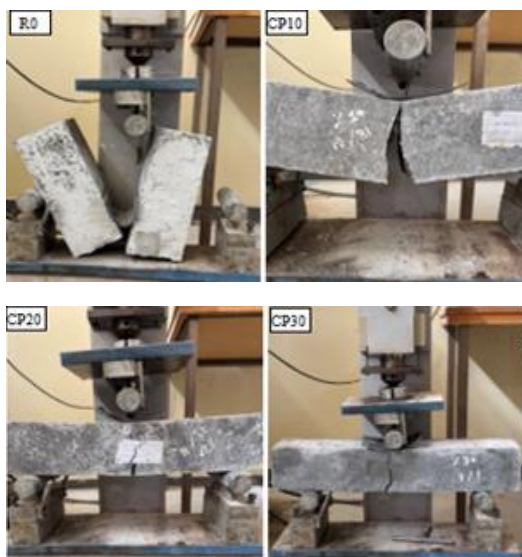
Failure pattern of specimens (Impact test at 28 days).
